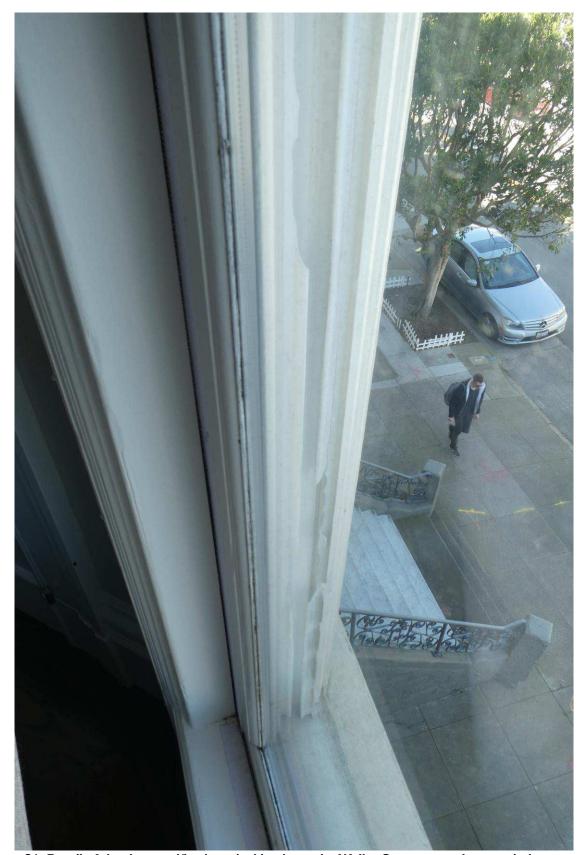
Detail of the damaged/broken vinyl jambs at the Waller Street second story window exterior.
